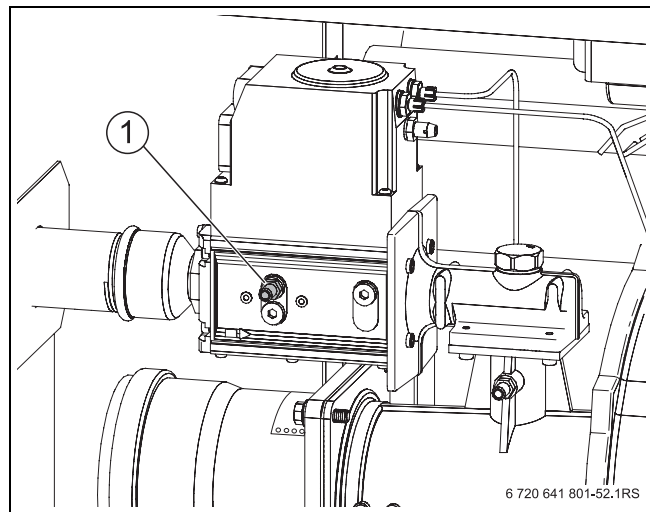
Checking the internal tightness (boiler sizes 200 to 280 kW)
